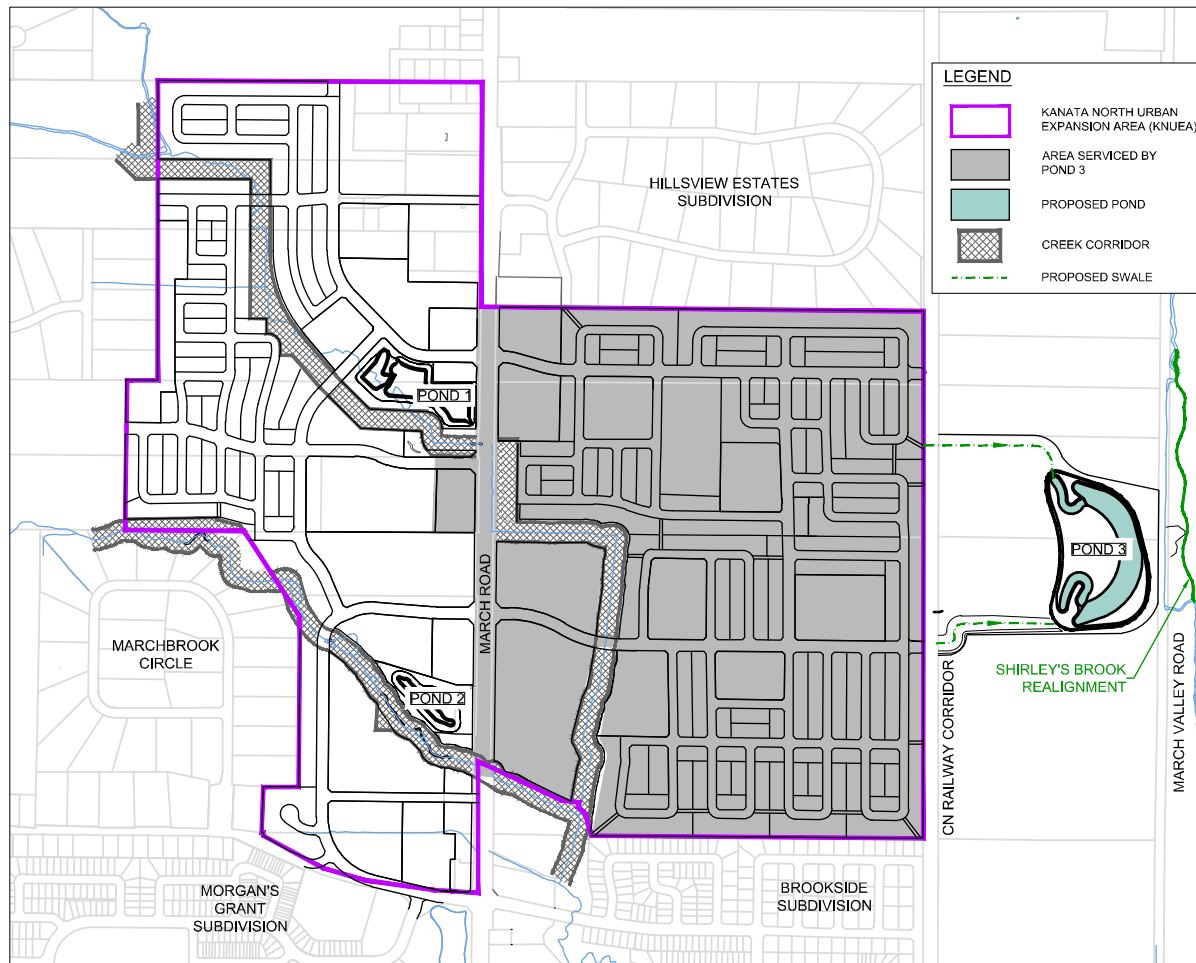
Stormwater Management Pond 3 and Service Area
